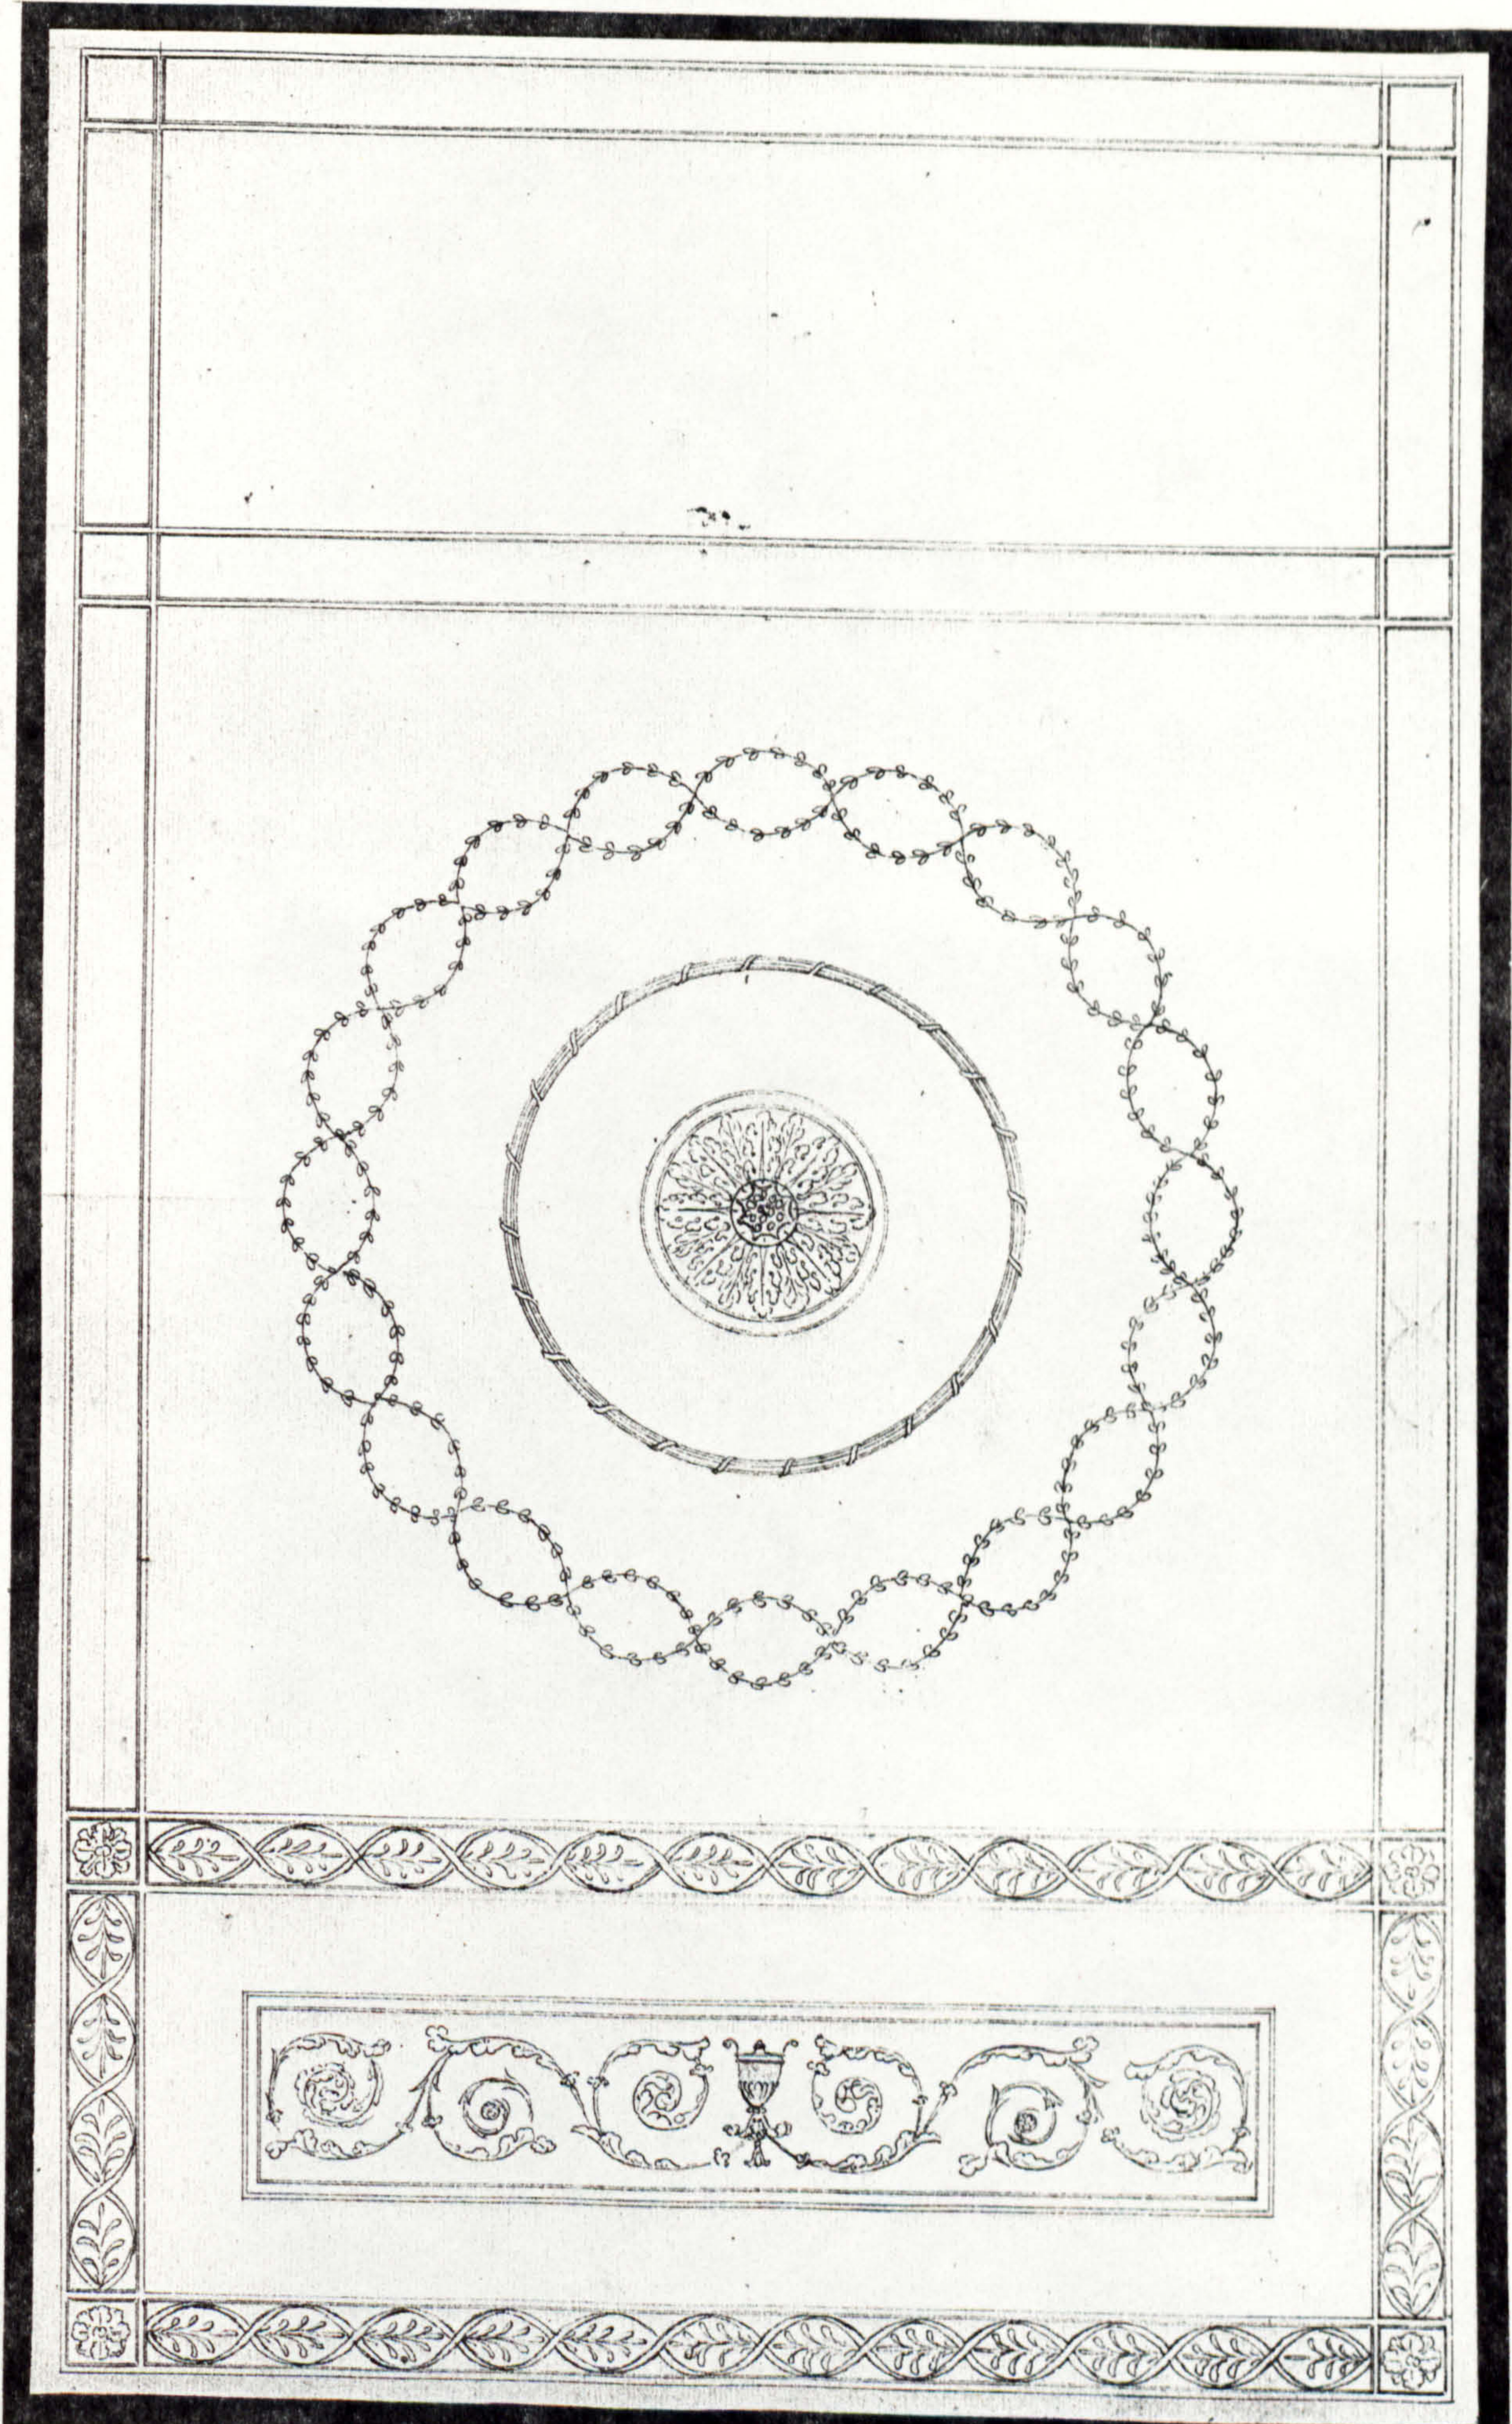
JAMES WYATT · CEILING FOR DRAWING ROOM · THIRKLEBY PARK · c.1784-7
